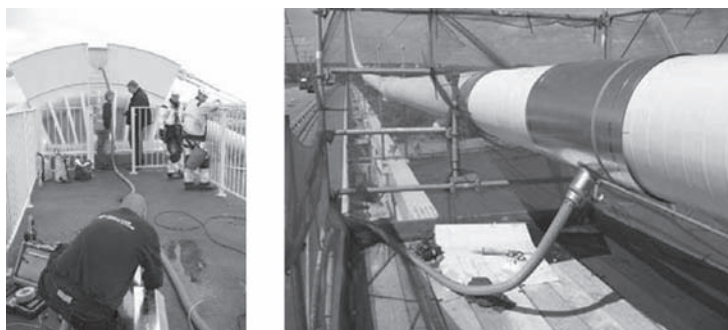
Injection and flow testing at tower saddle and mid span on the Älvsborg Bridge, Sweden.
